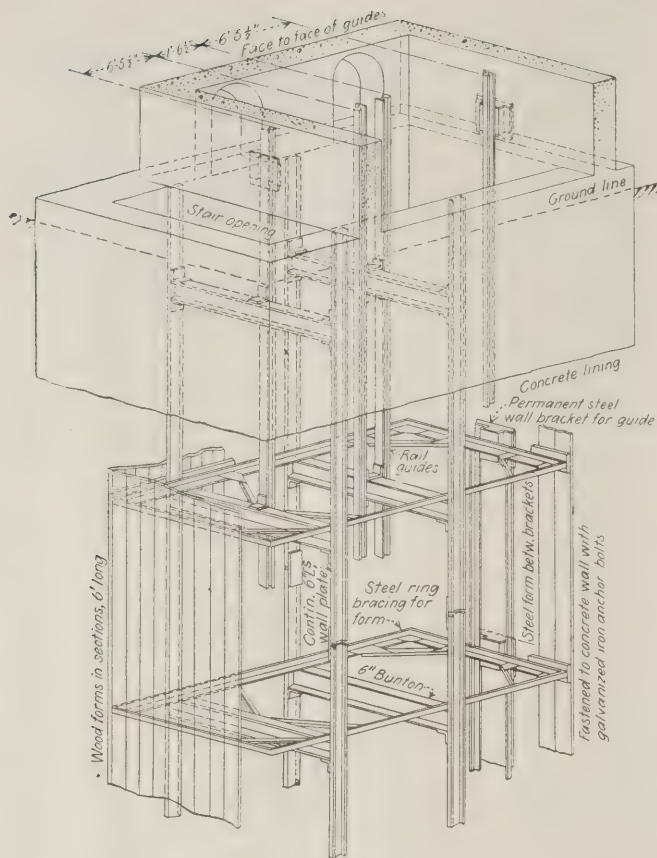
ISOMETRIC PROJECTION SHOWING DETAILS OF MAINSHAFT CONSTRUCTION
